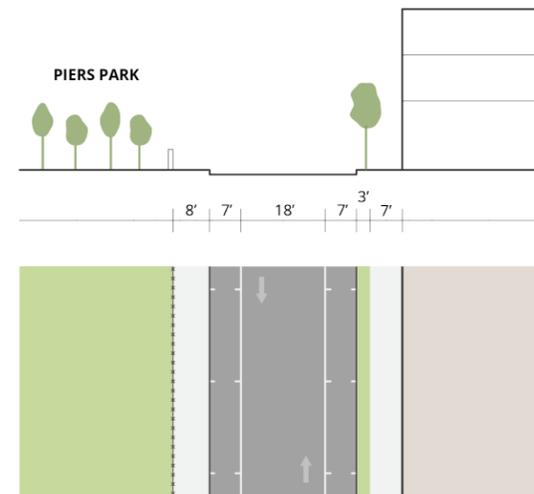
MARGINAL STREET SECTION - EXISTING CONDITION FOR PUBLIC WAY
